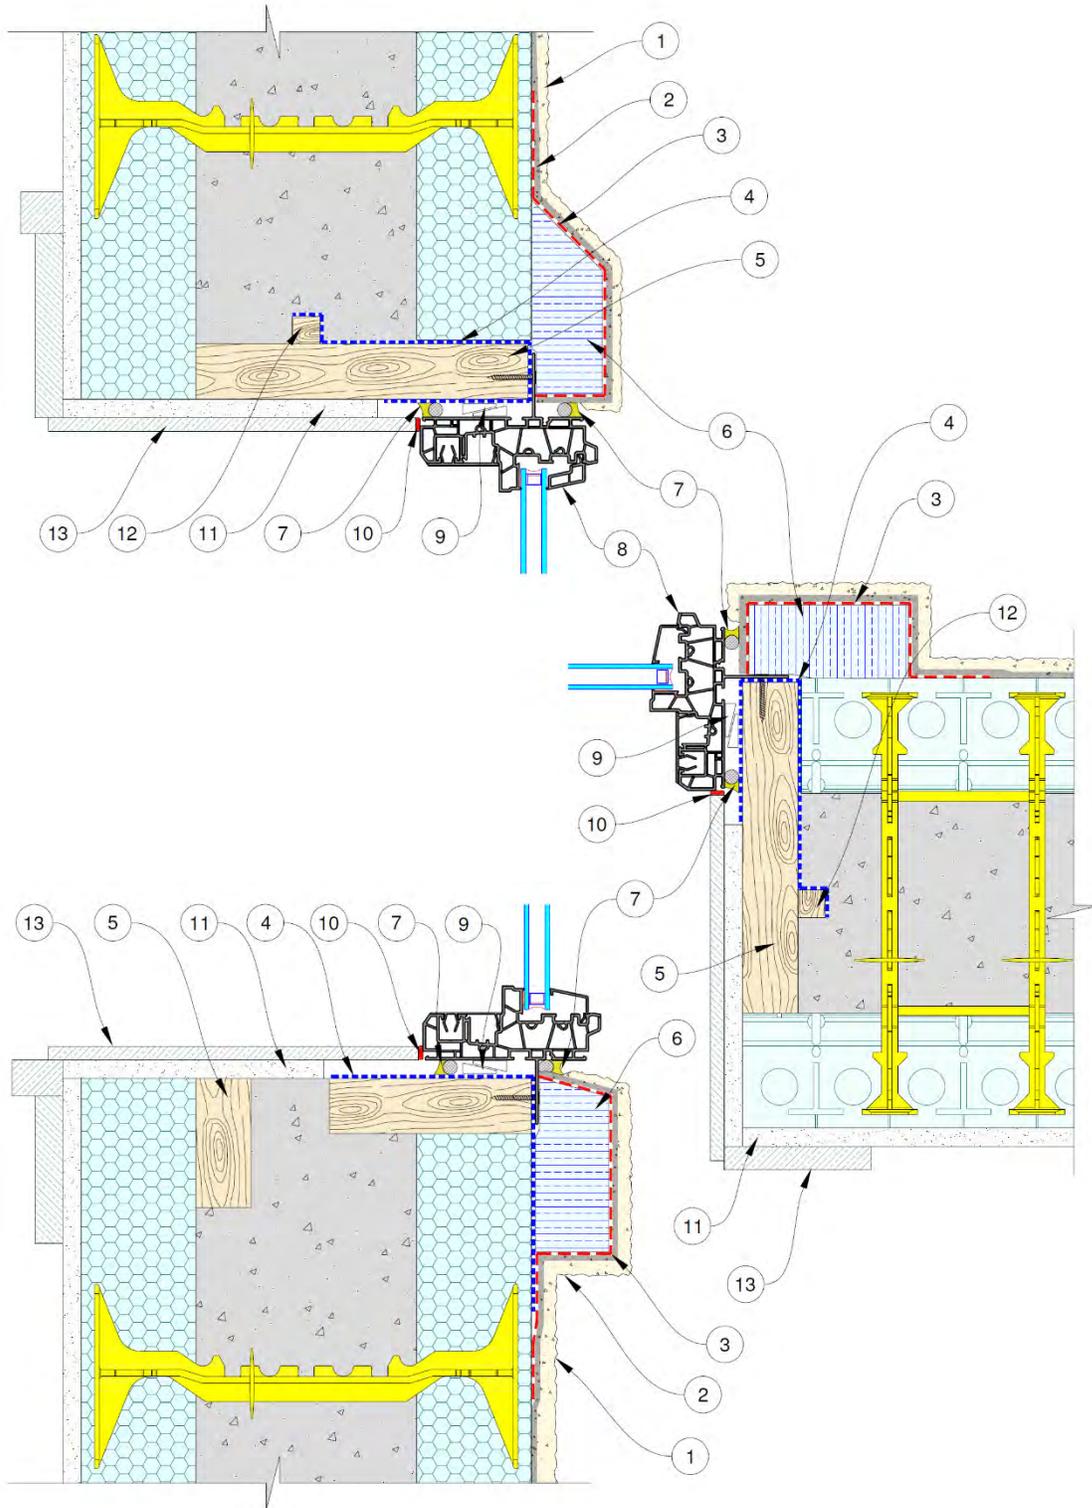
ICF Window Assembly: Wood buck-out, Flanged window flush to exterior, EIFS/Stucco lamina
